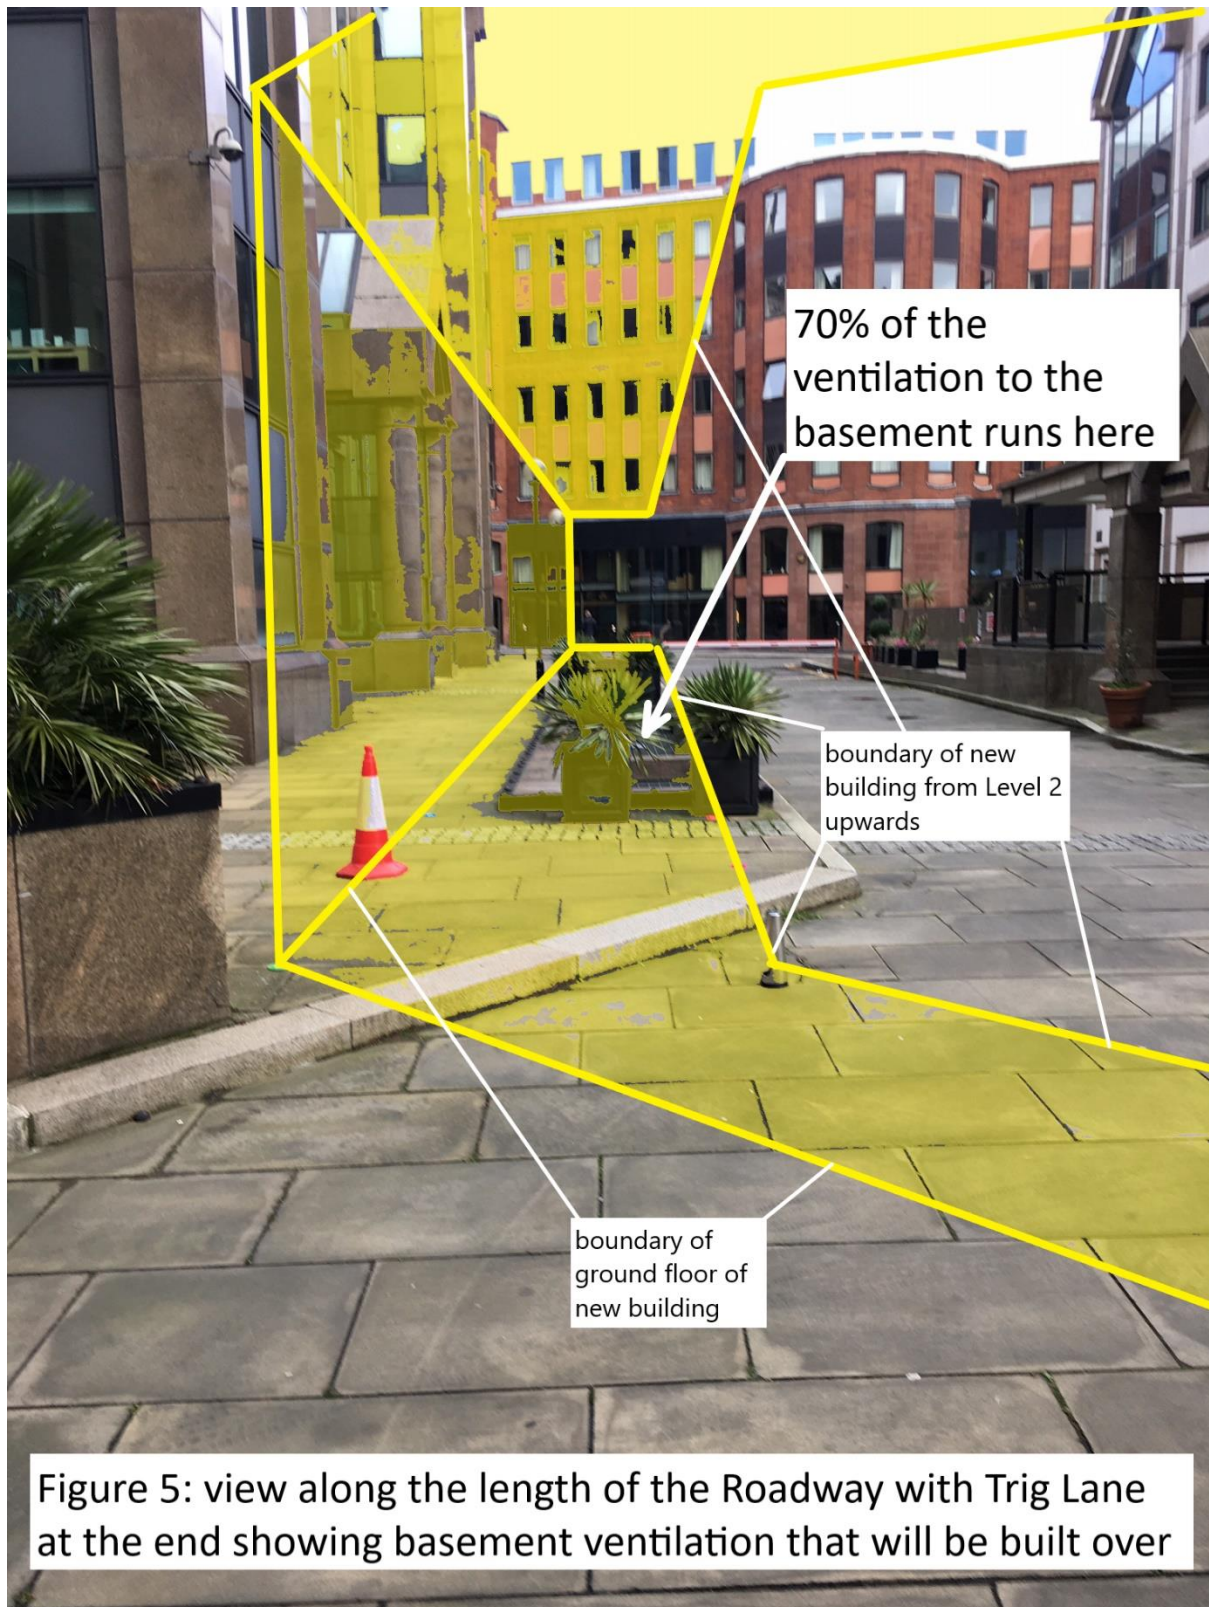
view along the length of the Roadway with Trig Lane at the end showing basement ventilation that will be built over
